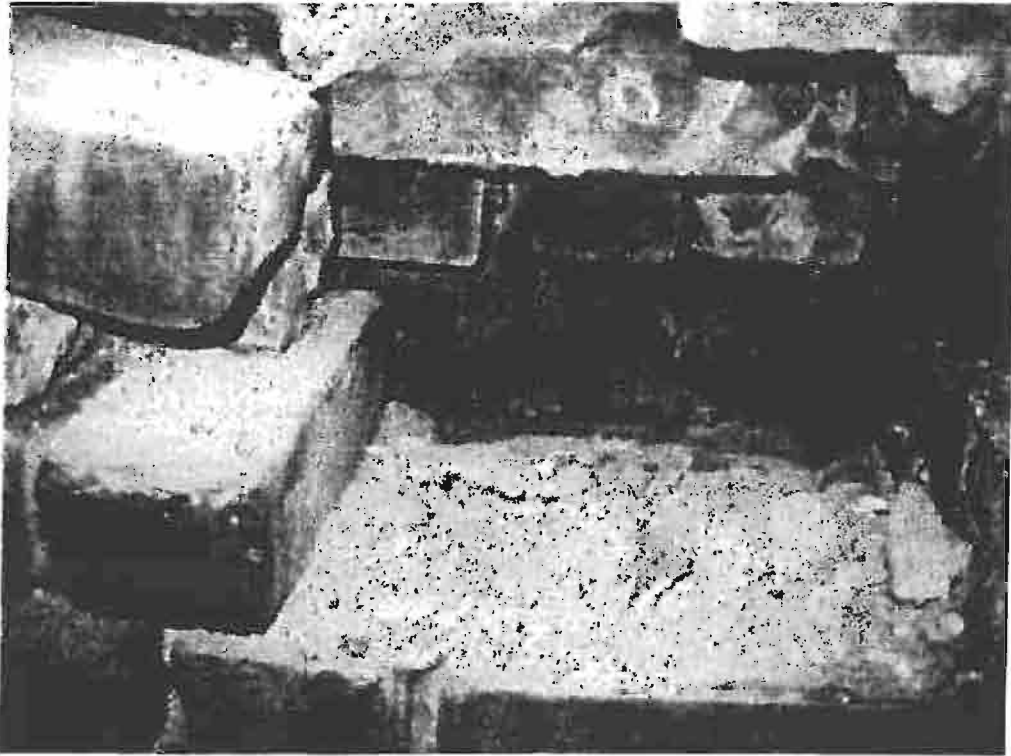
Upper East Wall. Brick Failure inside Attic Space.
